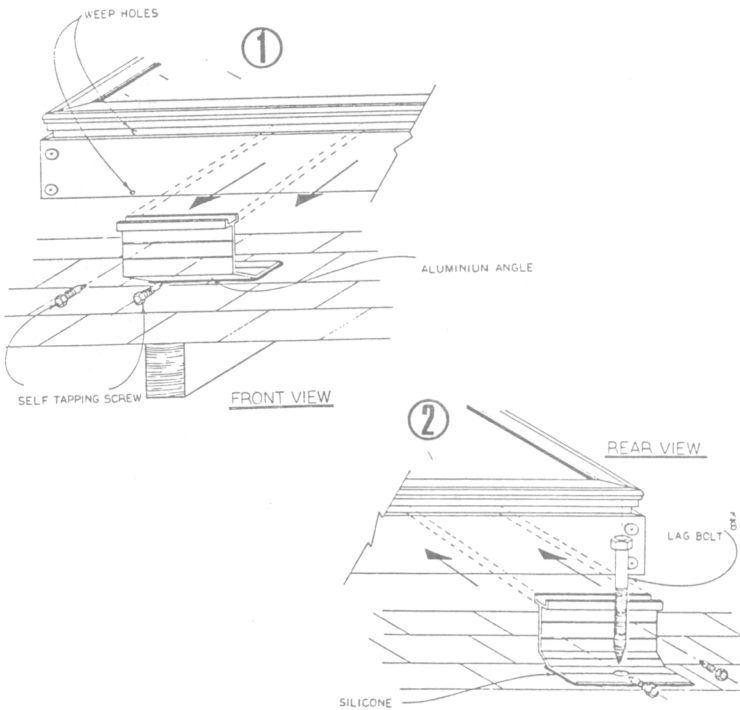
INSTALLATION DETAILS OF THE MOUNTING STRUTS
